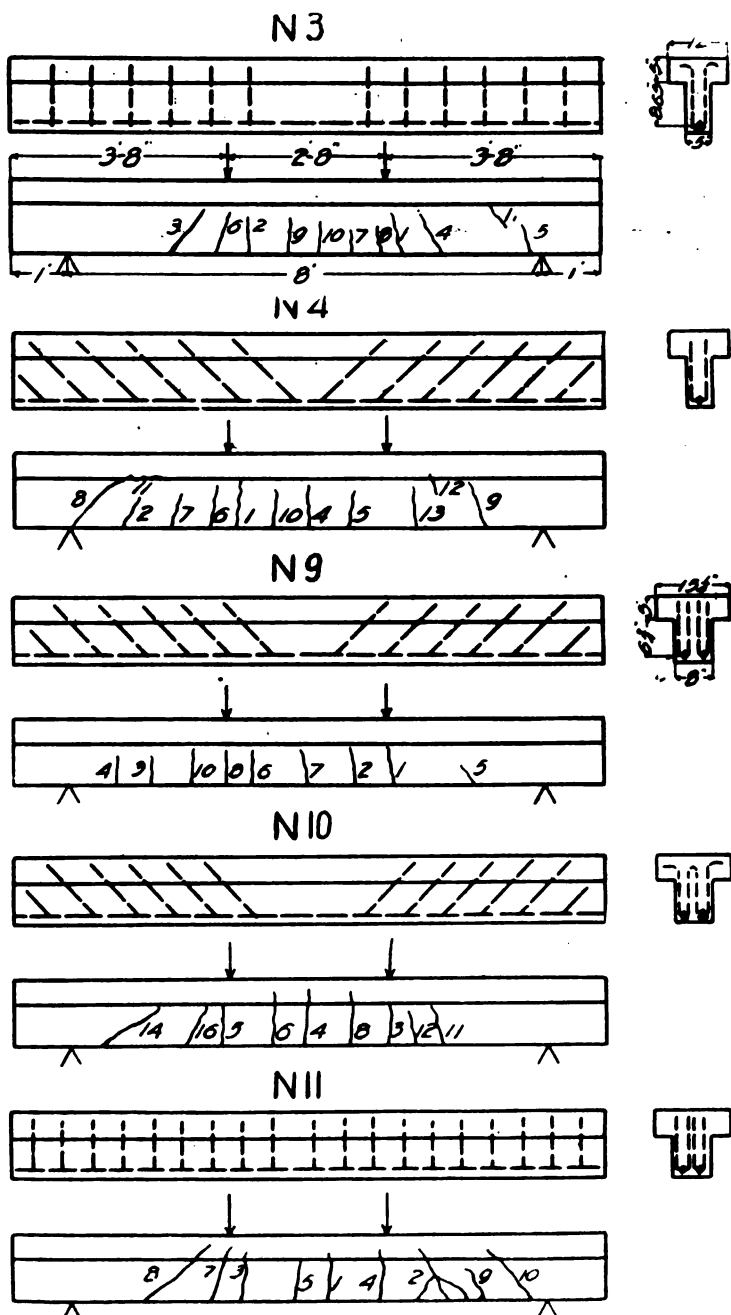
BEAMS OF SERIES N—REINFORCEMENT AND CRACKS.
